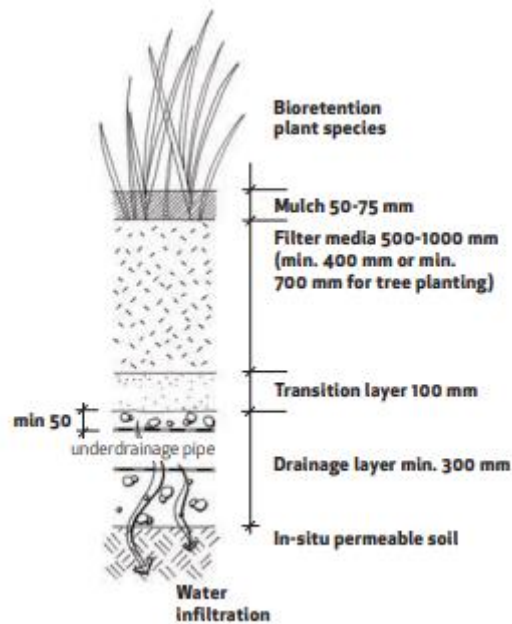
Cross Section of Bio-Retention Basin with a Conventional Drainage Zone
